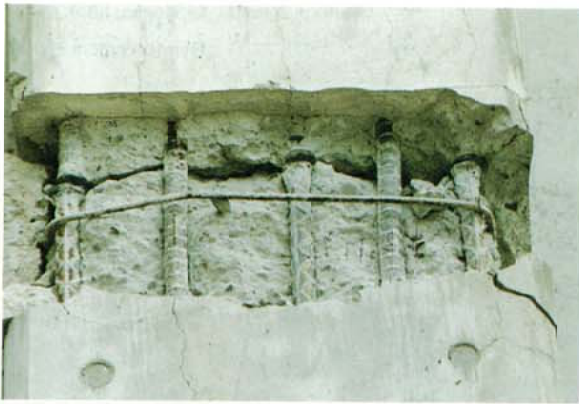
damaged joint in gas pressured welded parts
